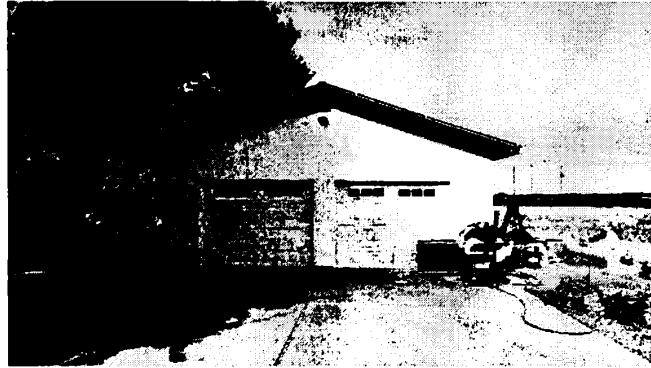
Rear of the residence, viewed from the northwest corner. Camera facing southeast, September 9, 2025.
